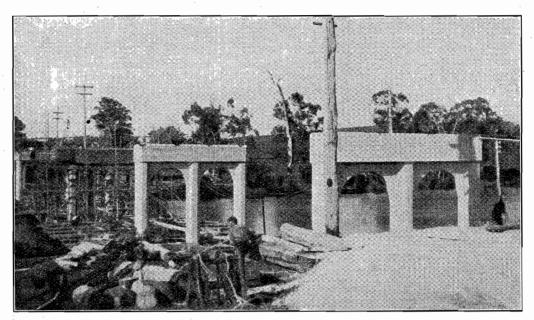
Princes Highway East. Sub-structure of Swan Reach Bridge.
